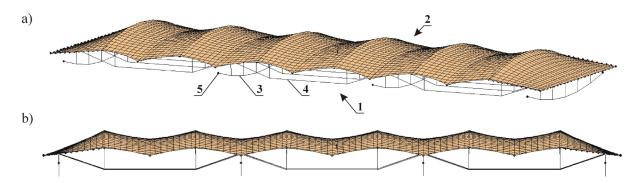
The proposed roof structure^{3,4}. a - axonometric view; b - front view; 1 - the frame of the structure; 2 - flexible covering (membrane); 3 - primary member; 4 - ordinary member; 5 - fixed support (e.g. column of the building)
